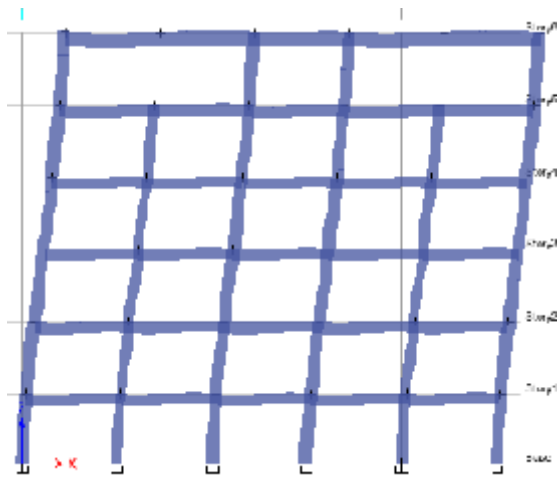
Deformed shape of FC building with combined lift shear wall provision and critical members dimension increment
